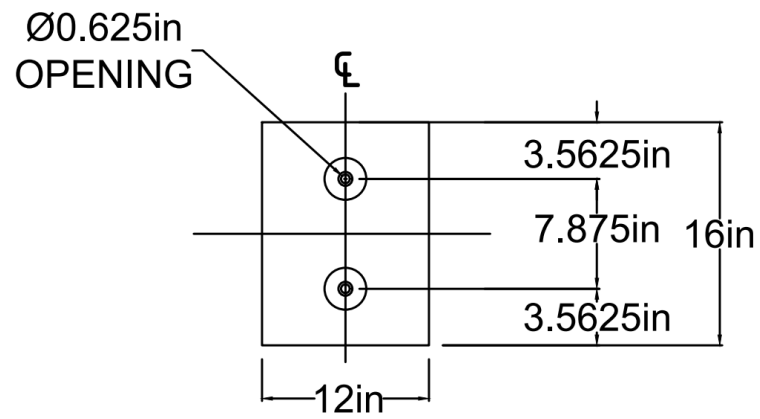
Plan view of small-scale CLT specimens (credit: E. Baas)
